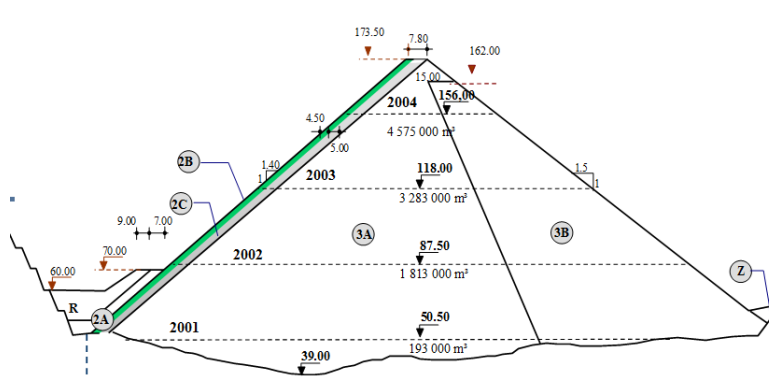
Typical section of Dim Dam (Çavuş, 1994)
